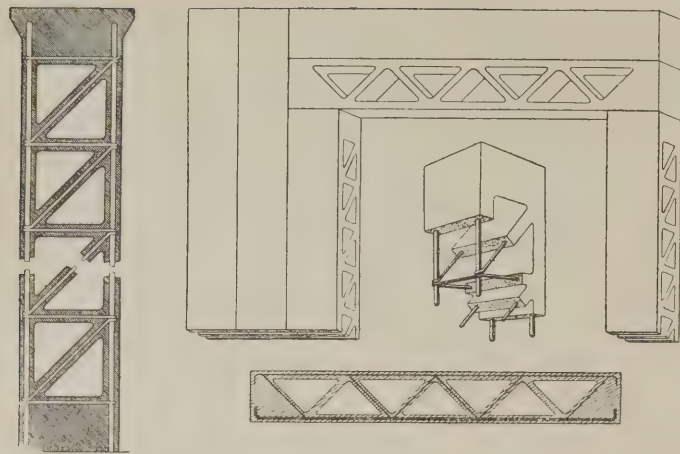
COLUMNS BUILT UP OF ARMoured CONCRETE LATTICE-GIRDERS.
